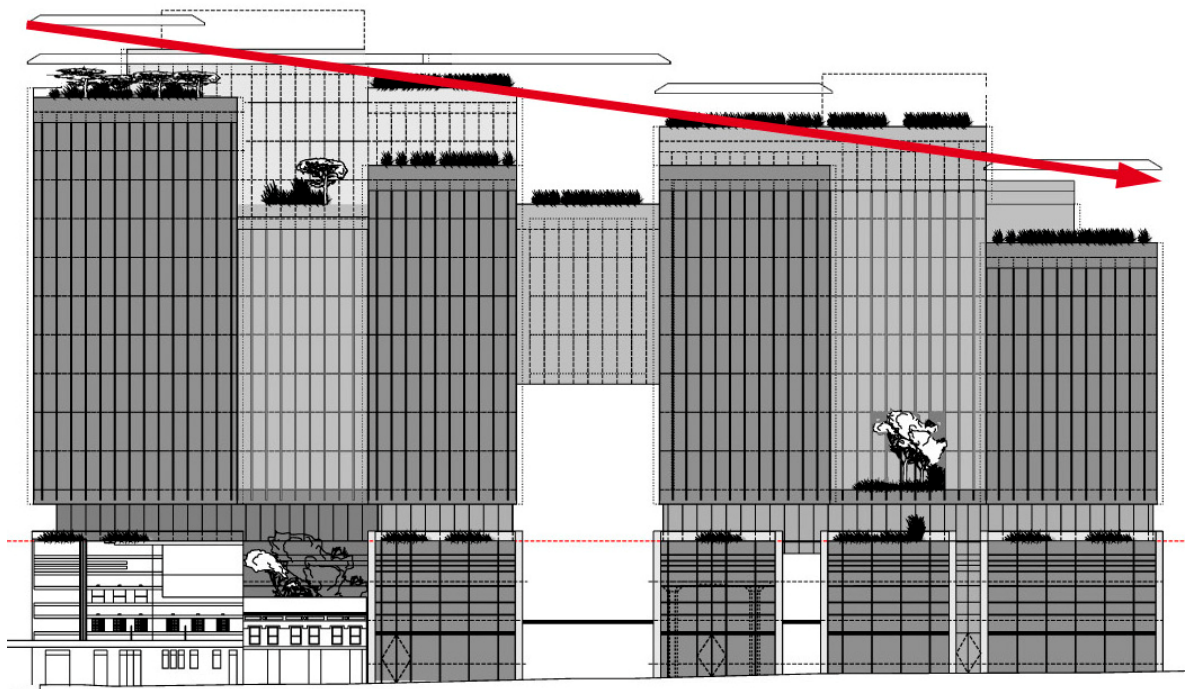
Block 4a Building Height Transition – Abercrombie Street Elevation
